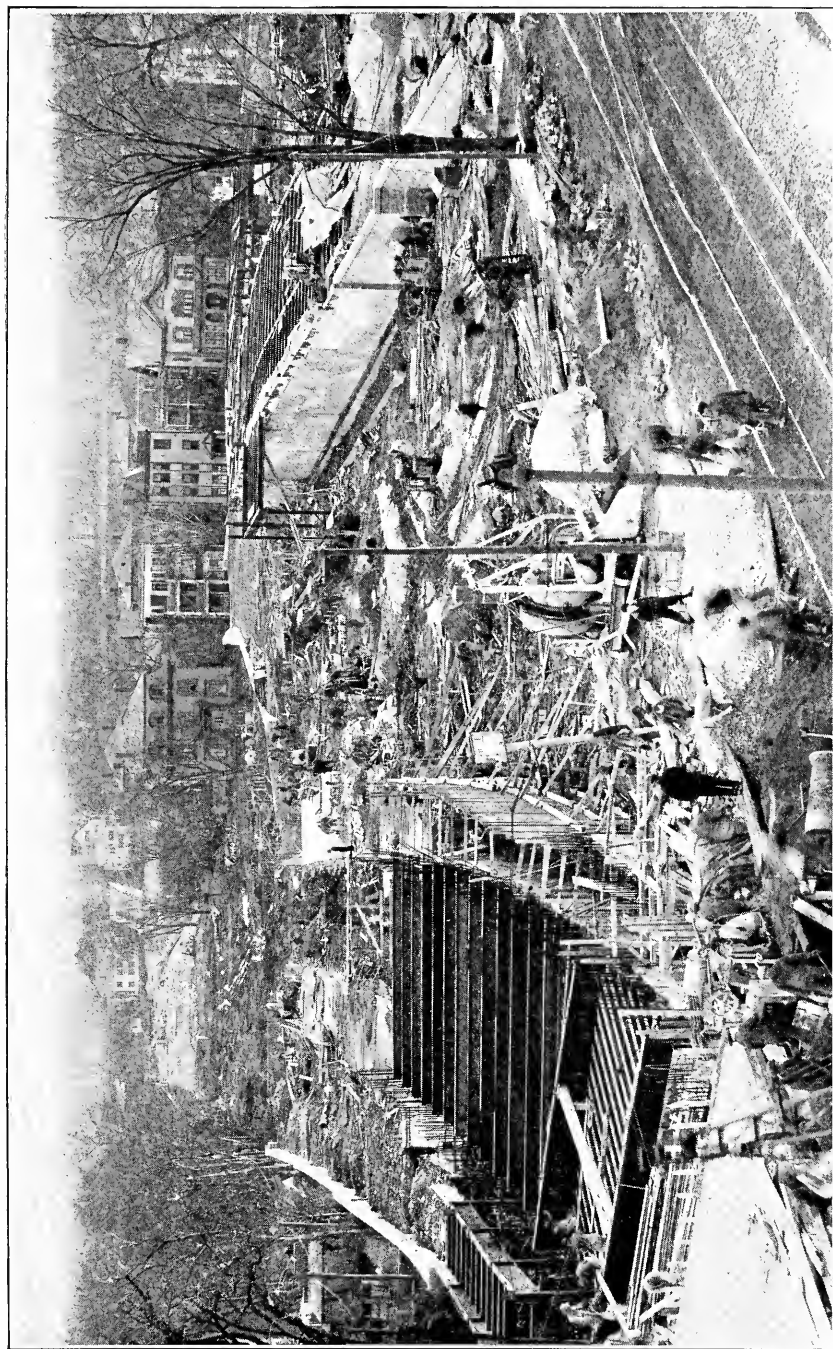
PLATE XIV.—GENERAL VIEW CONSTRUCTION, ASHMONT STATION.
